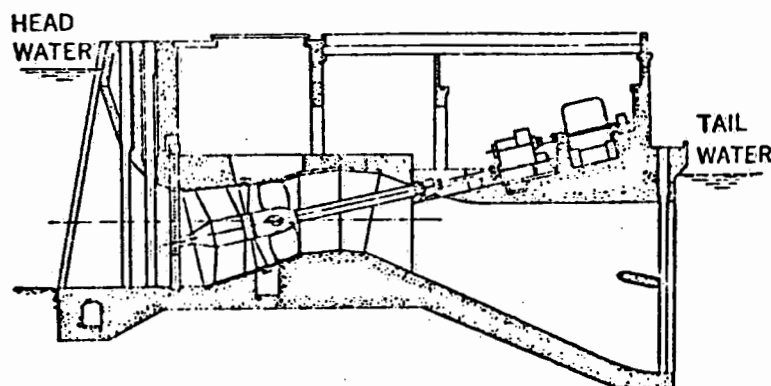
Powerhouse cross-section showing TUBE turbine arrangement.
